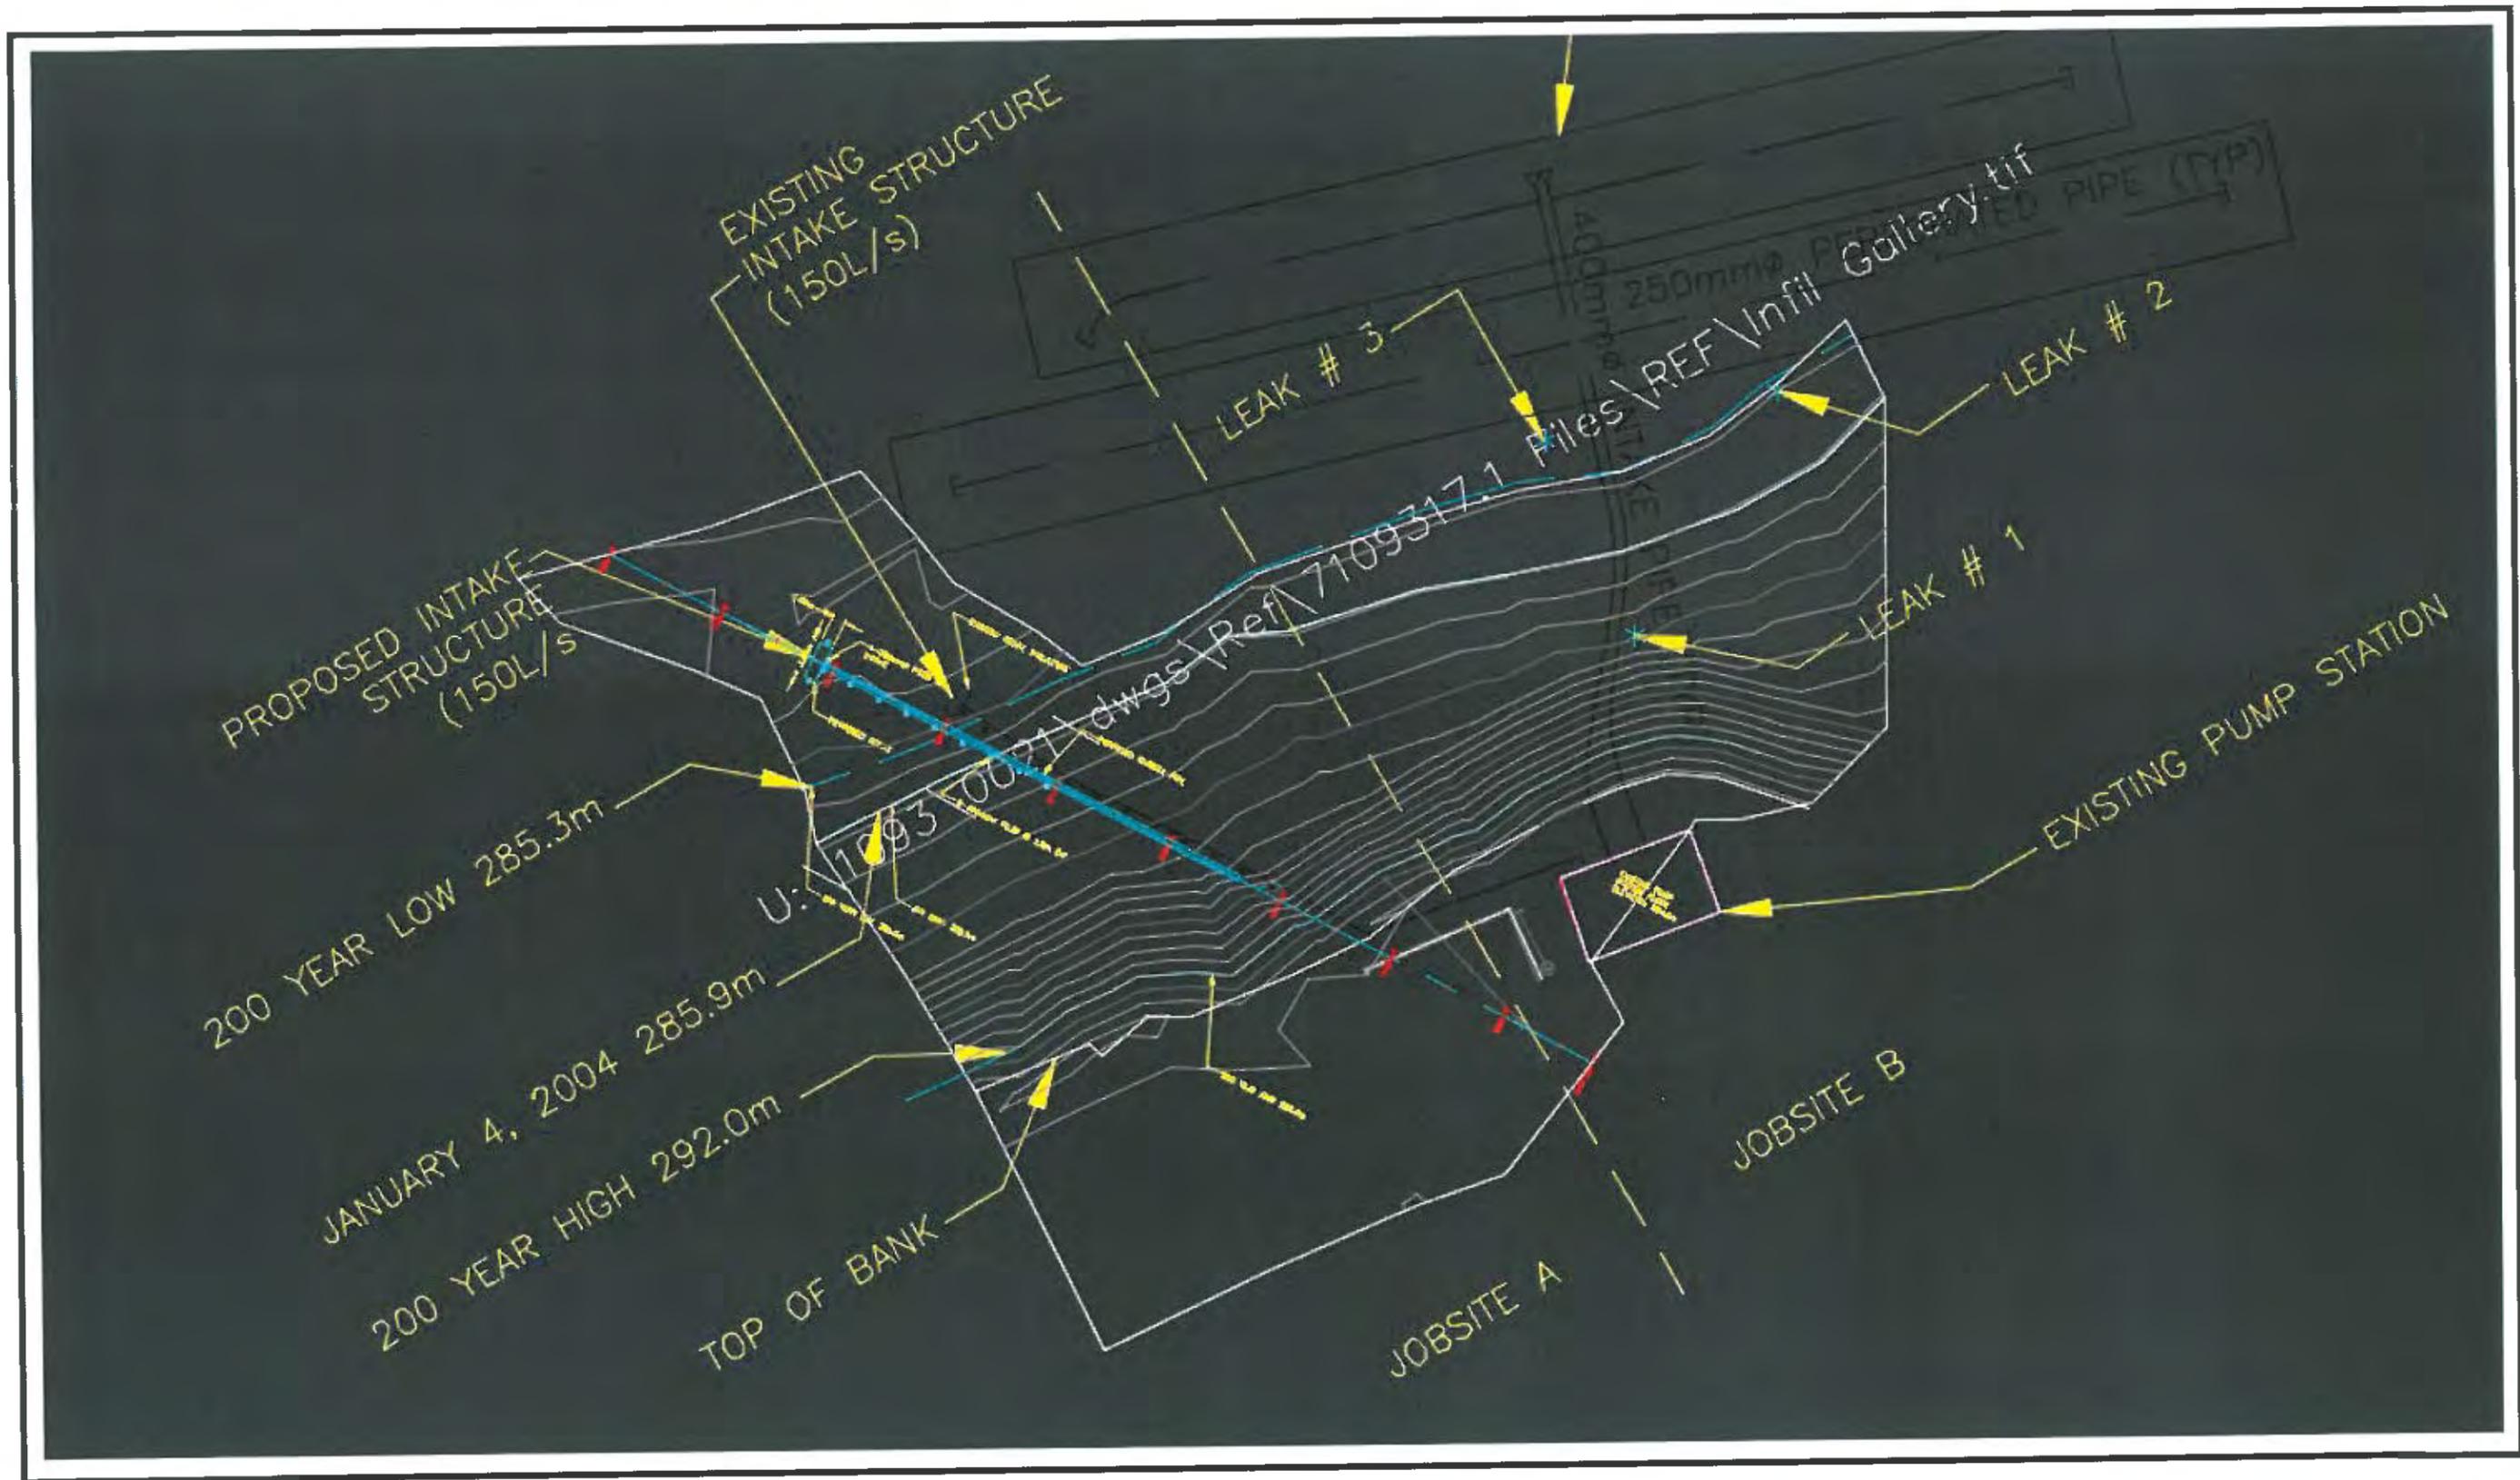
Design plan of the intake pipe installed to augment or replace the infiltration gallery (from Urban Systems Ltd.).
